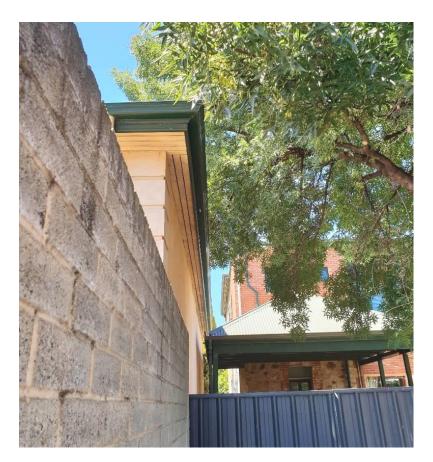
Gutter at 95 Jeffcott Street extending over northern boundary of subject site
